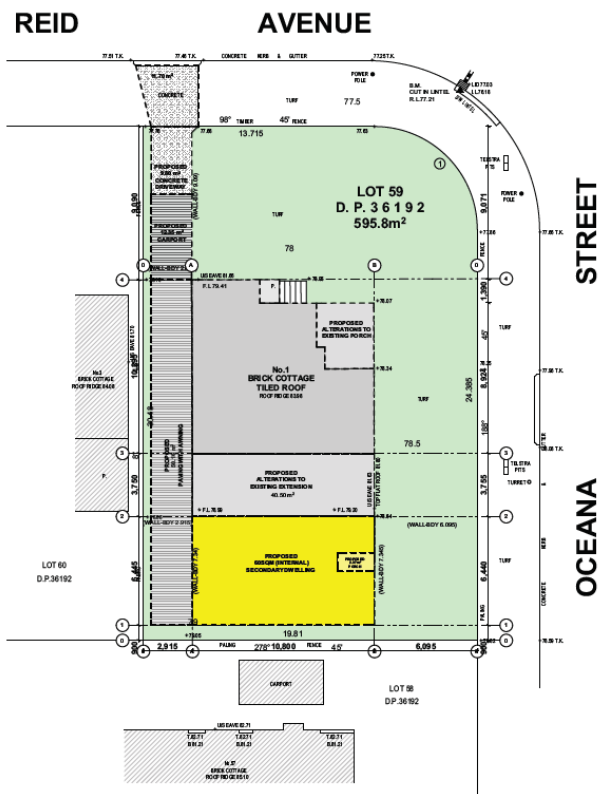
Site Plan proposed in the Development Application DA2018/0805
